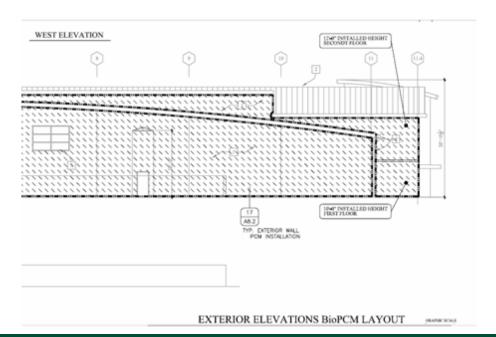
PCM INSTALLED IN THE EXTERIOR WALLS OF THE NEWLY CONSTRUCTED TRAINING CENTER
